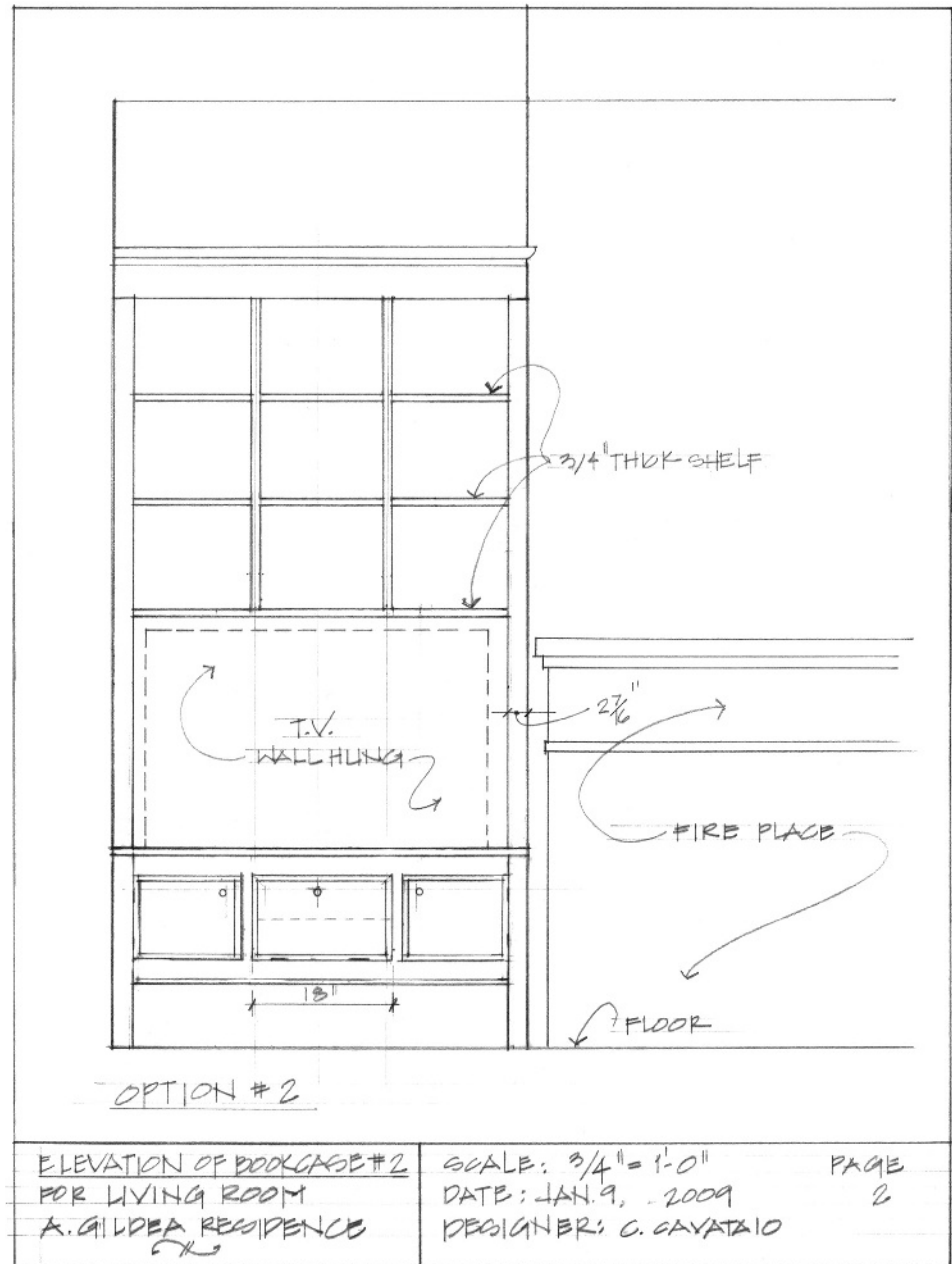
Elevation of built-in bookcase with notes and dimensions
